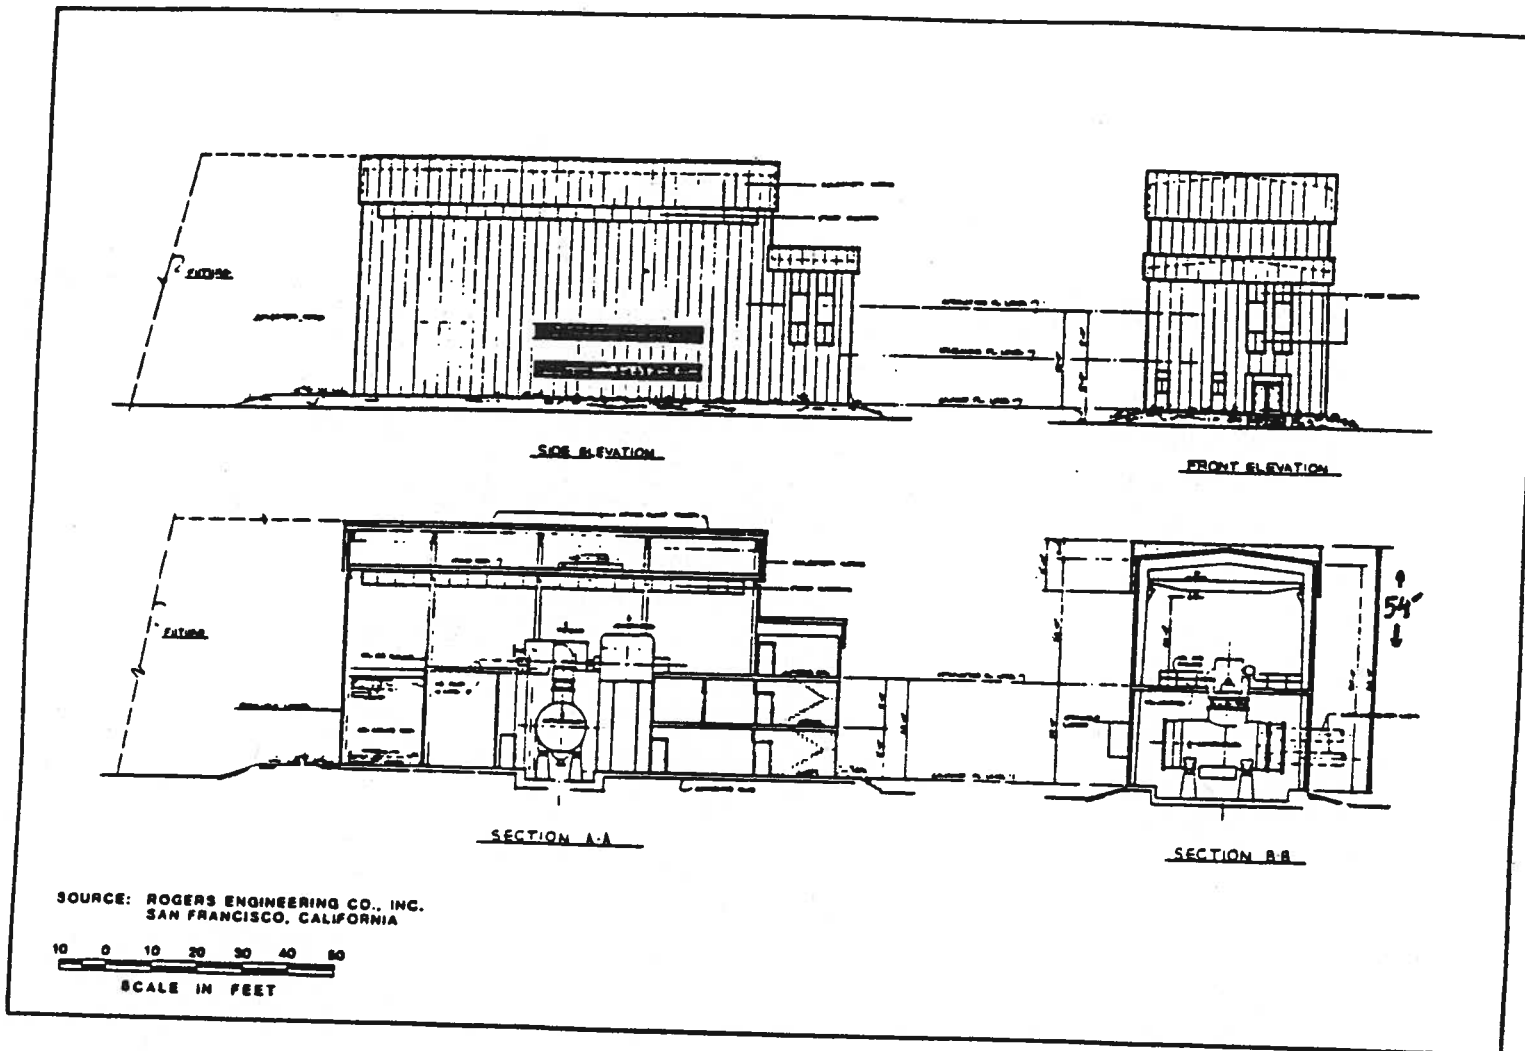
Elevations and Sections - Initial 12.5 MWe Power Plant.
